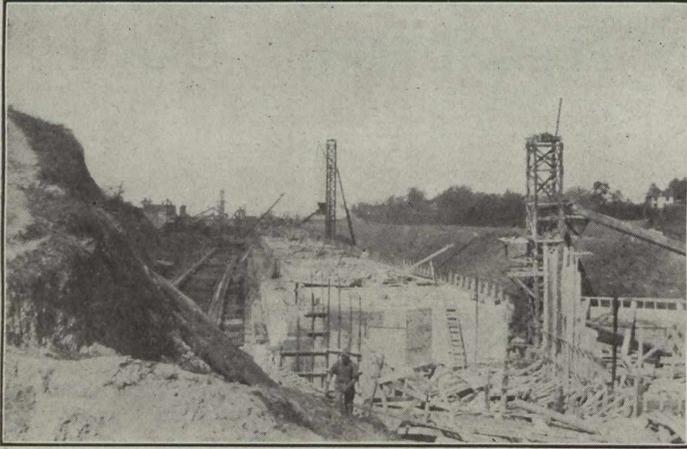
West Wall of Lock No. 1 Under Construction.
